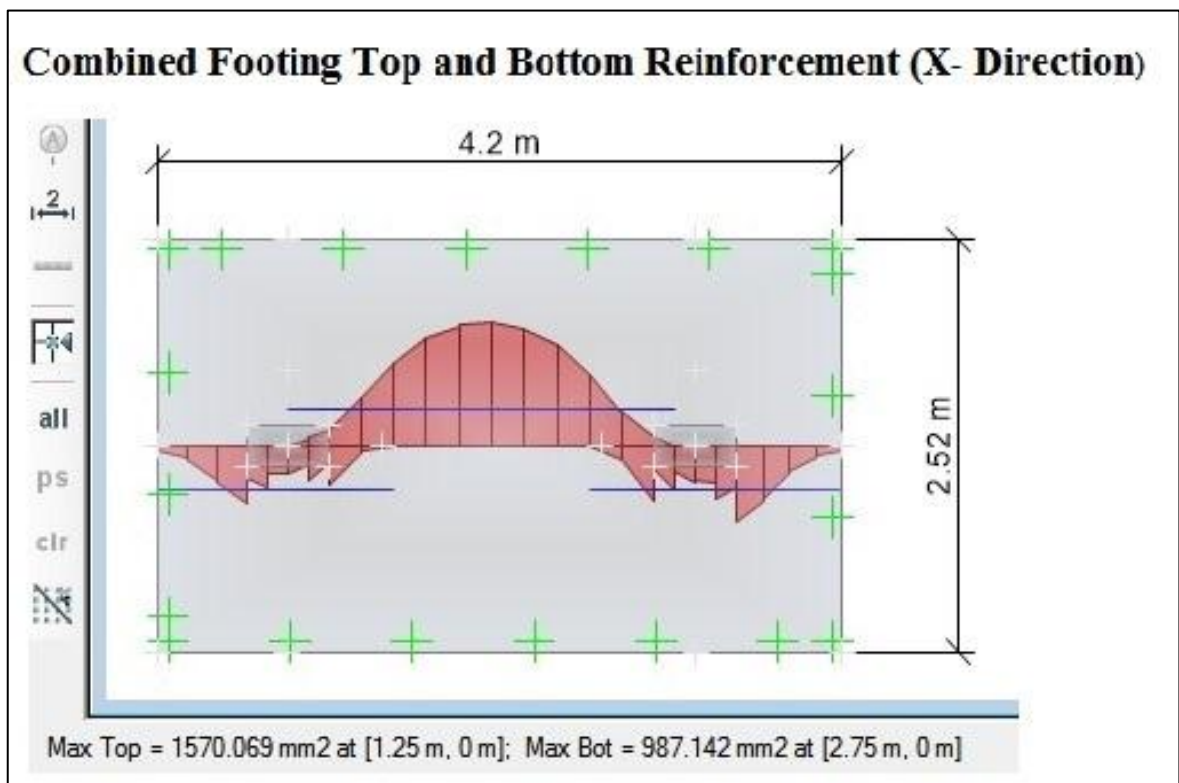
Combined Footing Top and Bottom Reinforcement (X- Direction)
